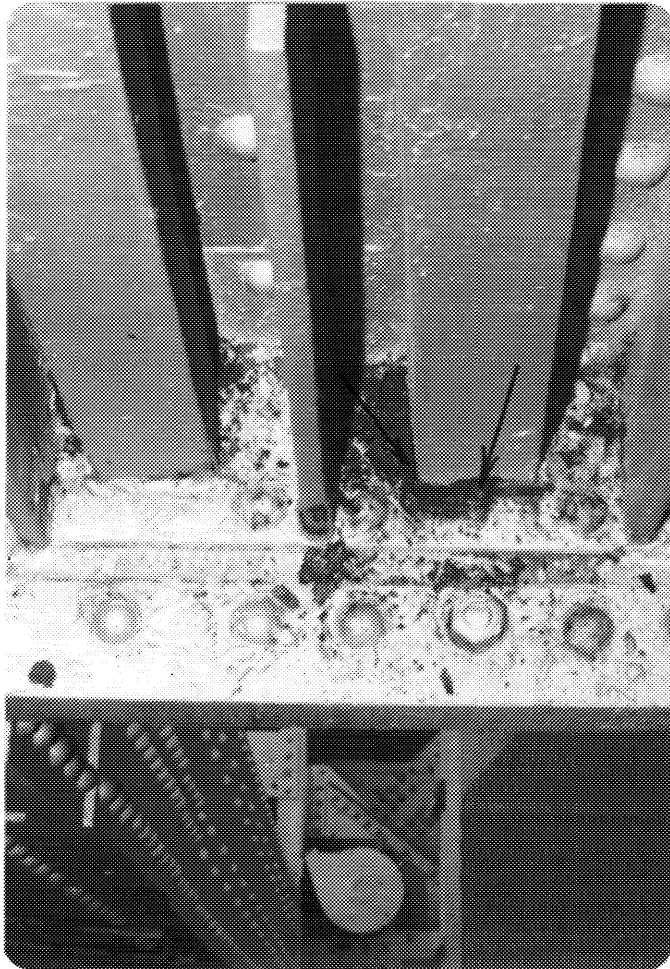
through 83 show conditions of the top laterals and sway frame bracing. Table 2-1 lists the sway frame lacing bars with a minimum loss of 25 to 30 percent. Sway frame angles in need of replacement are listed in the recommendations.
